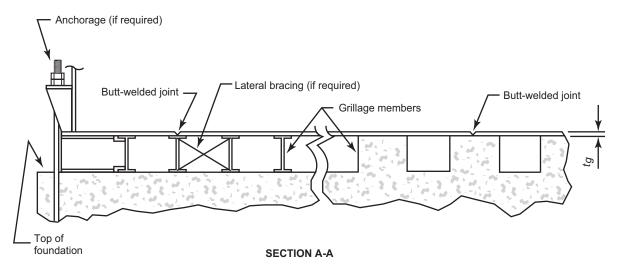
Tanks Supported by Grillage Members (General Arrangement)
